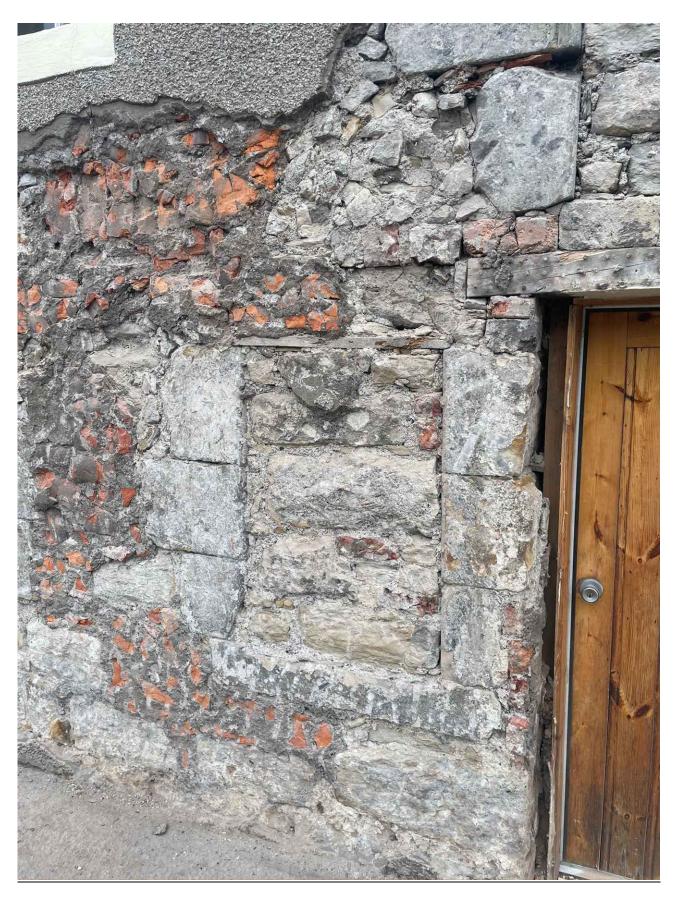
Original window filled in with sandstone to the west of the front door. Brick and cement infill to fill in gaps in the wall for the cement render applied in the 1960's
